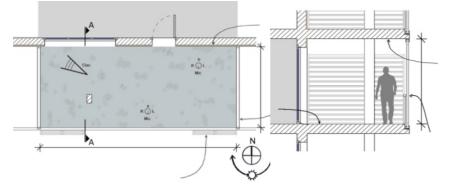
Residential building with double skin balconies on the façade. Vigny-Musset - Grenoble, France.
